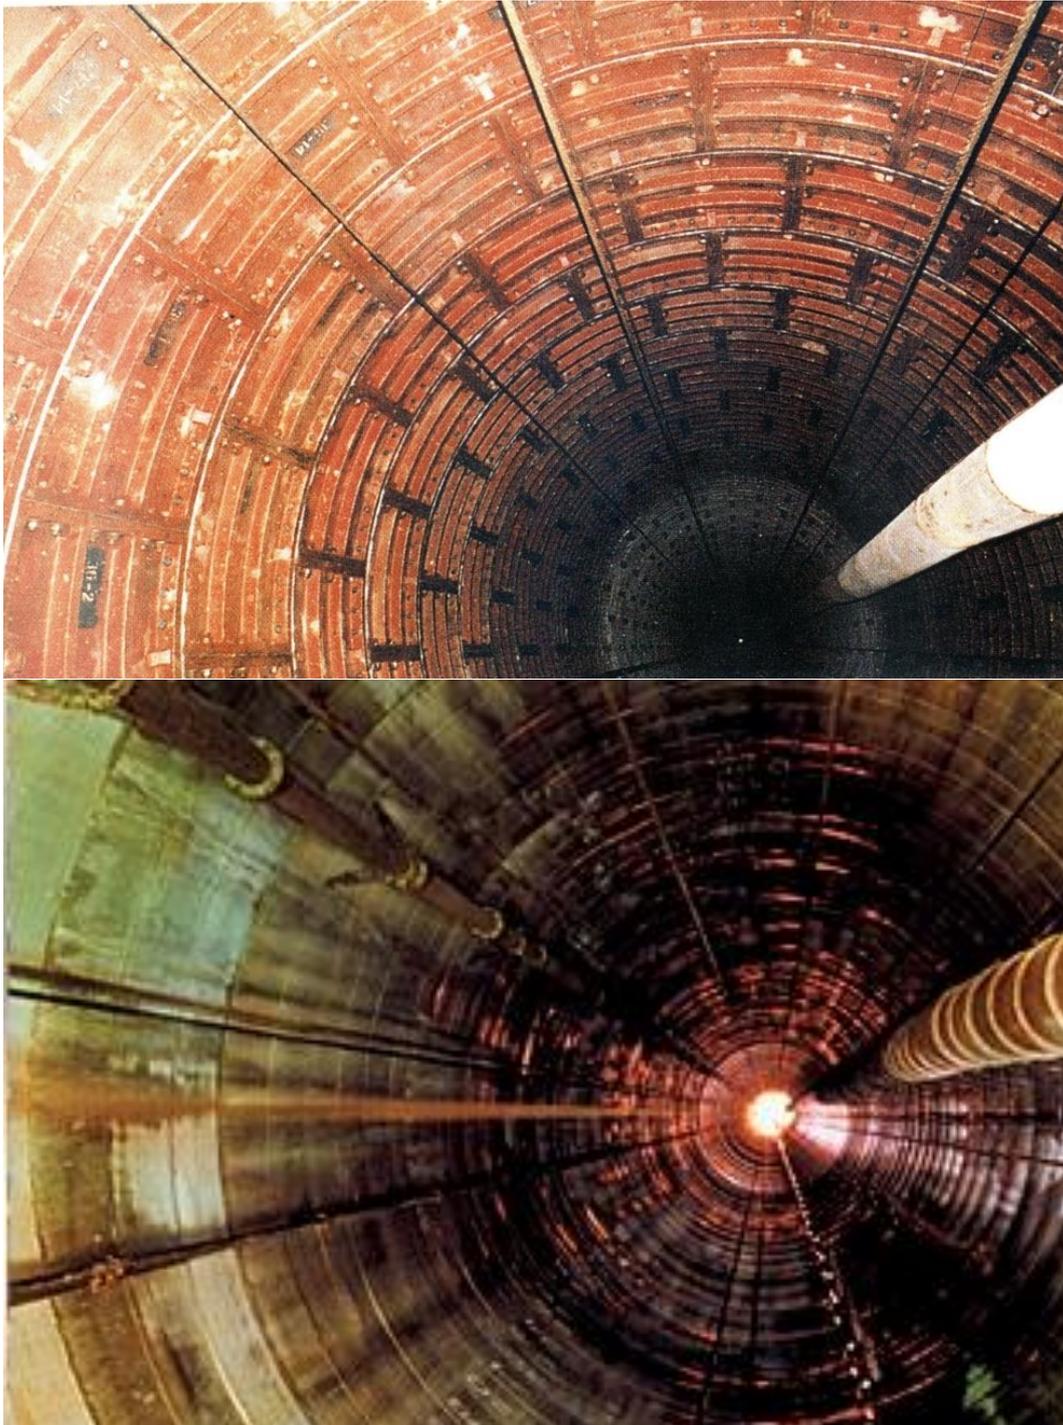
An example of the shaft with the iron cast (above) and concrete lining (down)
